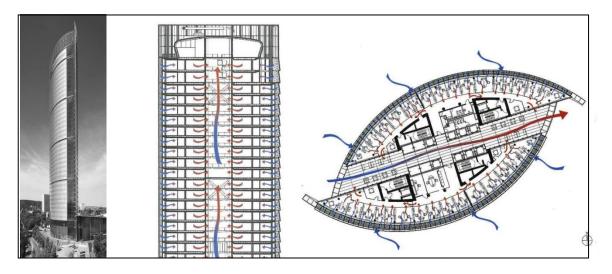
20: Post tower, section and plan (wing wall + atrium) (Al-Kodmany, 2015)
